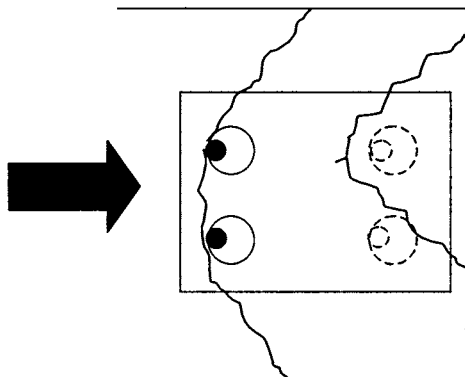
d. Possible failure mode after possible first anchor rod bearing on its baseplate shear hole has failed.
